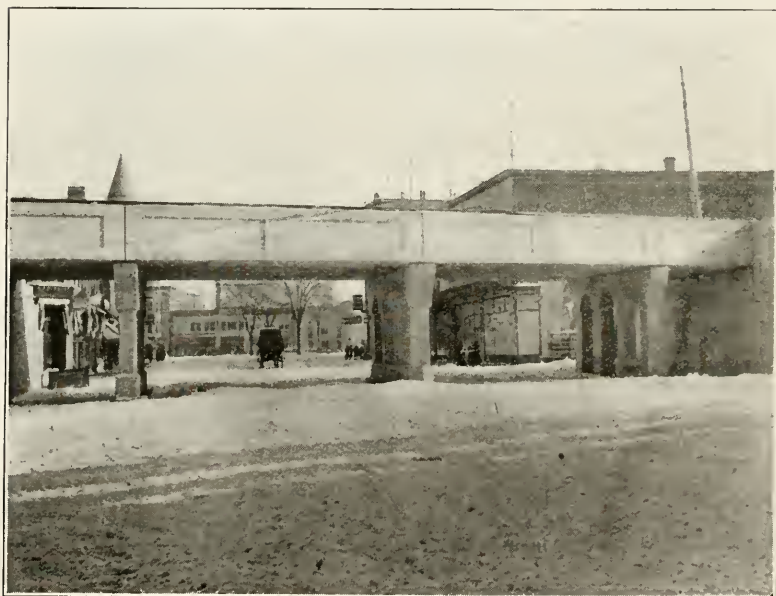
VIEW OF DAVIS STREET SUBWAY BRIDGE.
